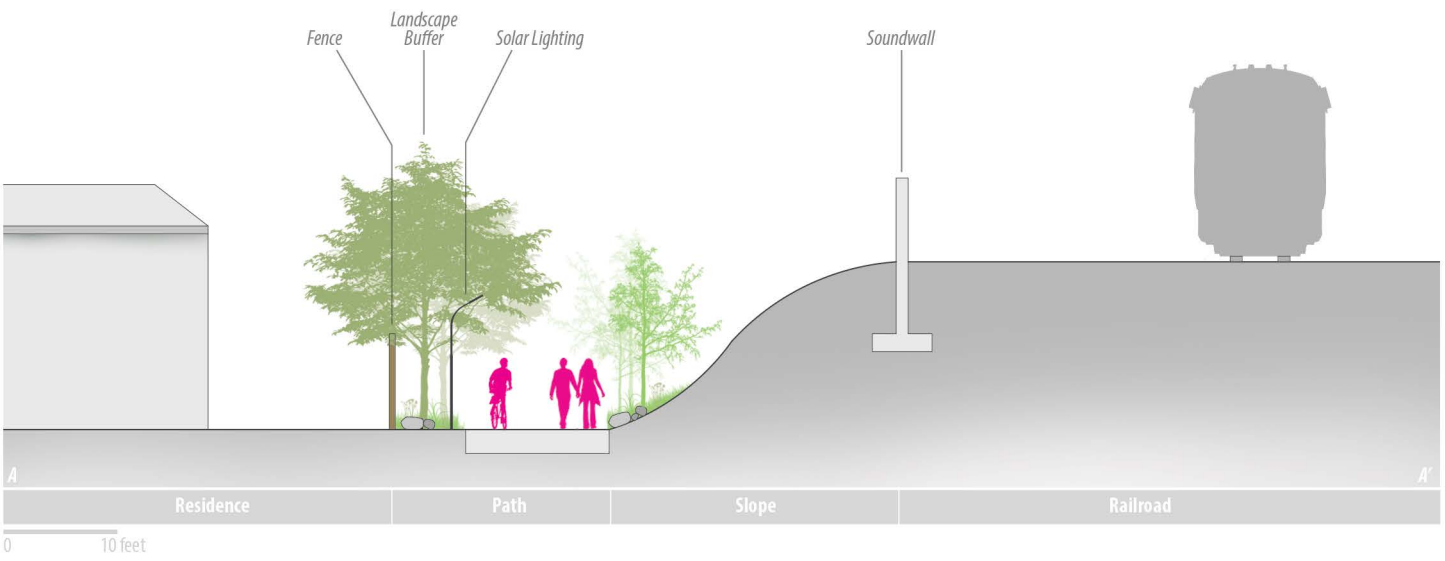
Railroad Corridor – Concept Plan and Section
